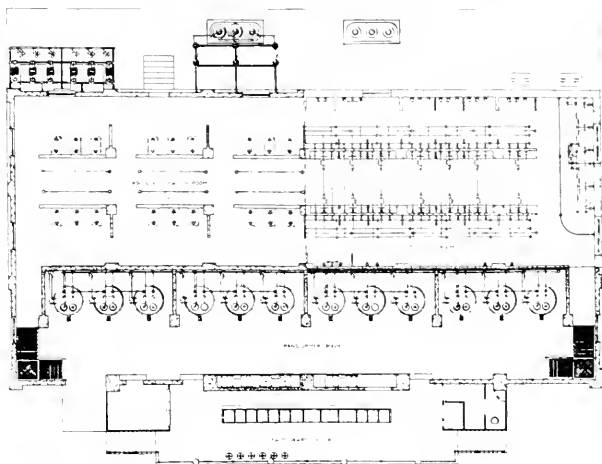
PLAN OF TRANSFORMER AND SWITCH ROOMS AND SWITCHBOARD GALLERY
